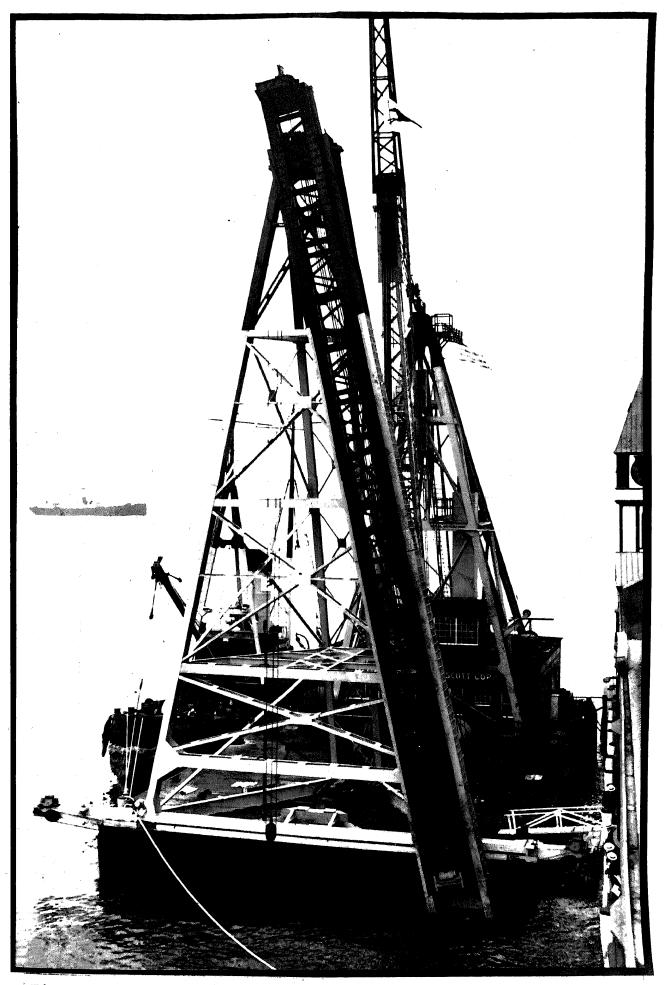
Steel tower and pile leads mounted on a derrick boat.
